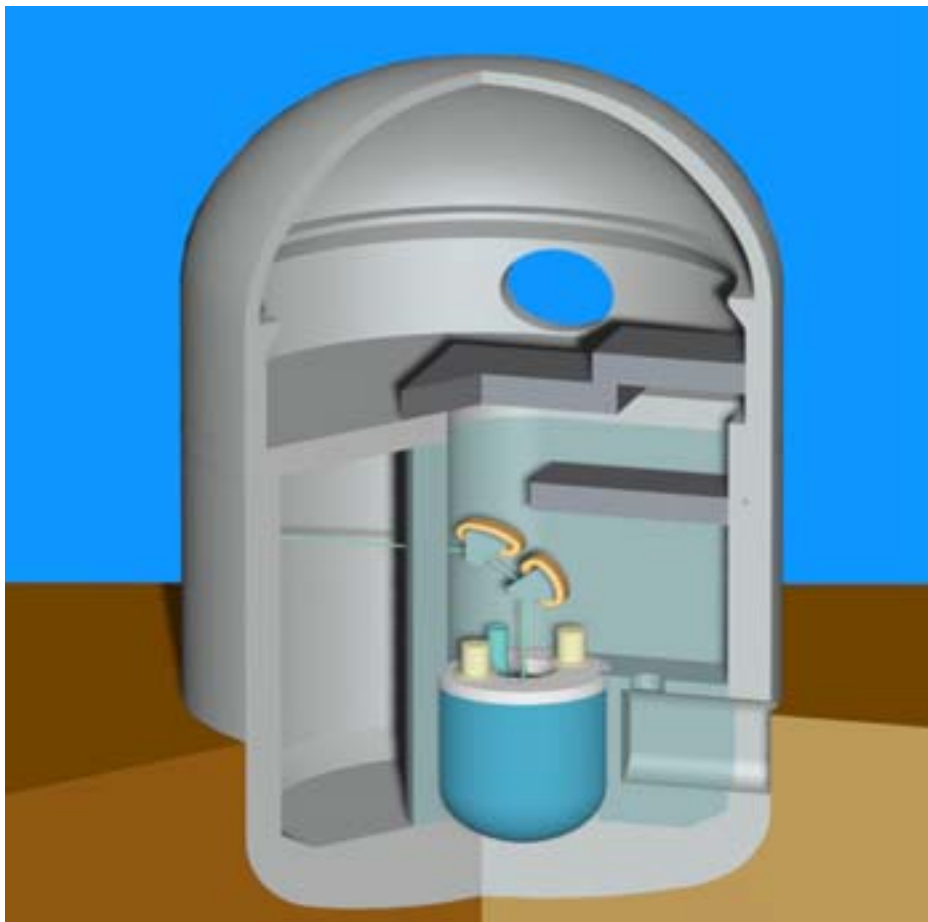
MYRRHA in an inaccessible confinement building, during operation.
